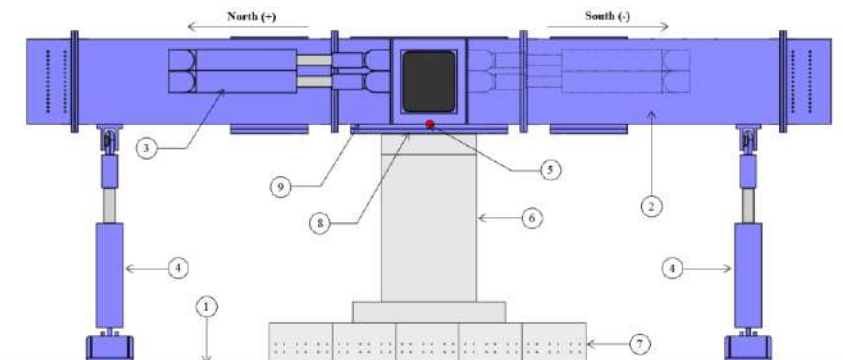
ETH Zürich MAST Facility: Longitudinal section
